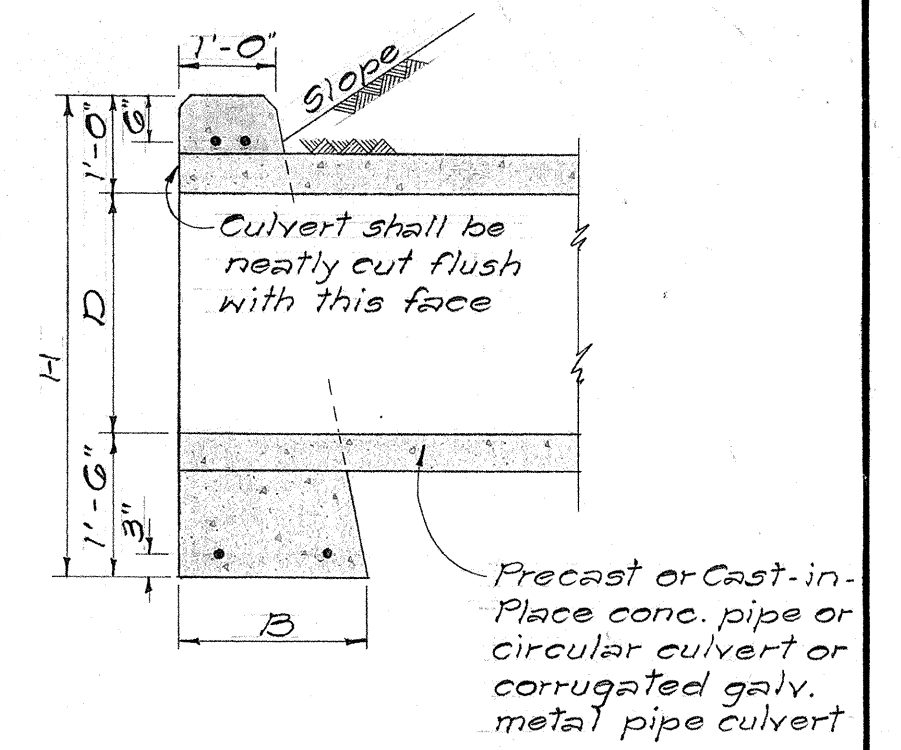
DETAIL OF CULVERT TO SPILLWAY CONNECTION
